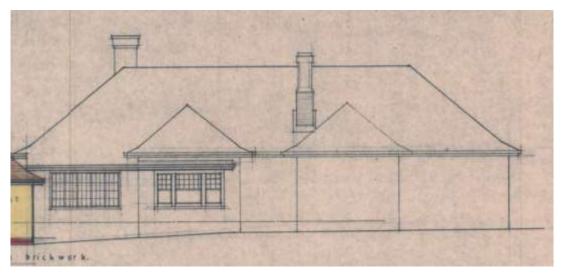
West elevation, facing Griffiths Grove, in 1987, showing separate roofs above bay windows and a chimney on this elevation. (Source: BP 2395/1987)
